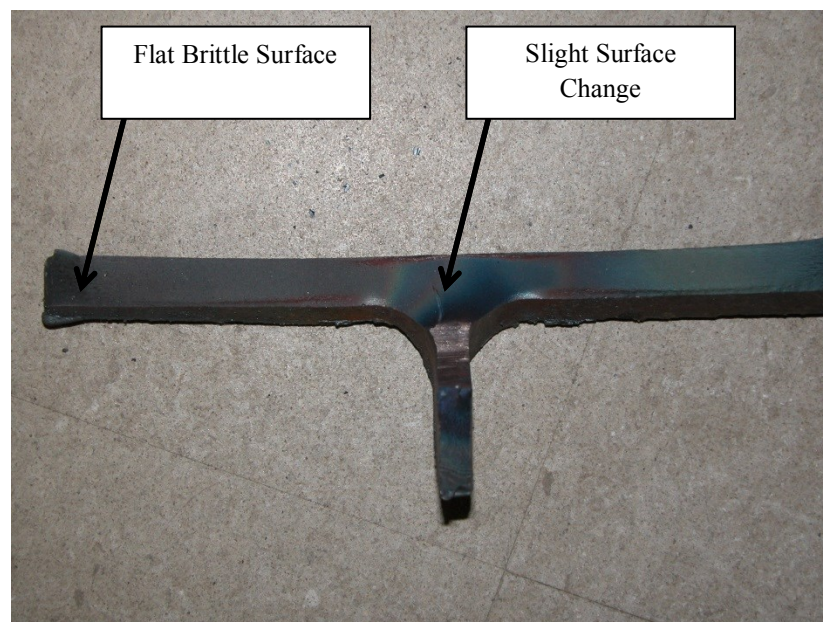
Fractured surface of side 2 of specimen G-N-2.
